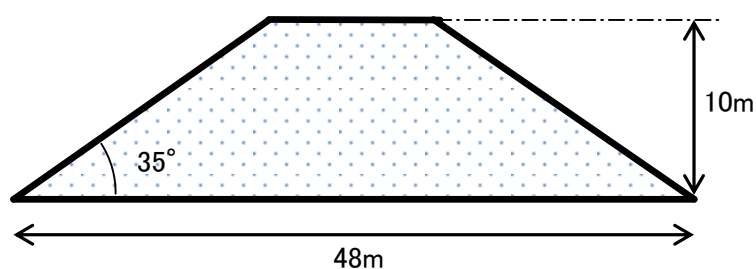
Cross Sectional Shape for Coal Storage Pile
